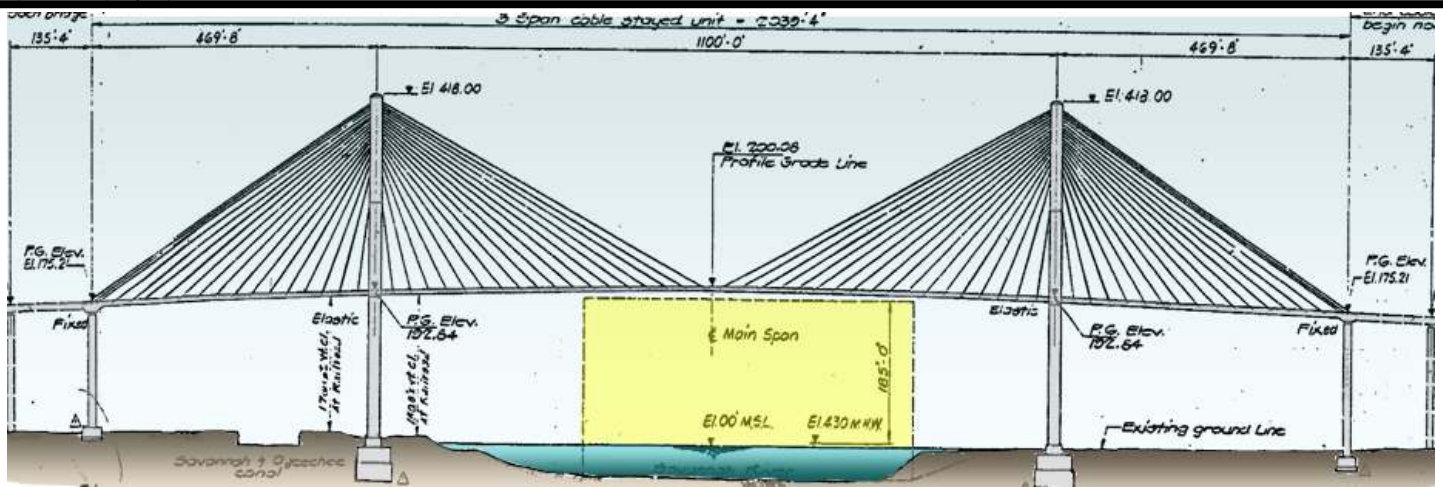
East elevation of the 3-span, high-level, cable-stayed main span Savannah River crossing in Savannah, Georgia.
